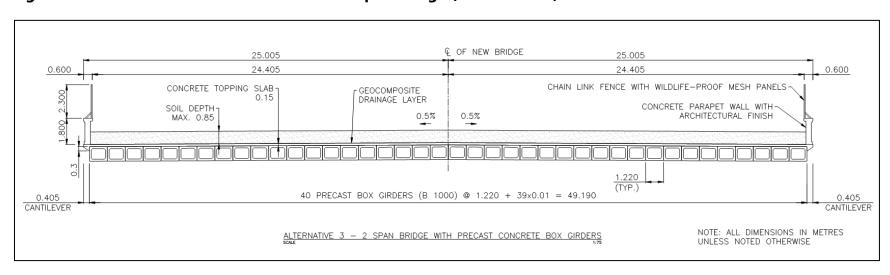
Alternative 3 - Wildlife Overpass (2-Span Bridge) - Plan View
